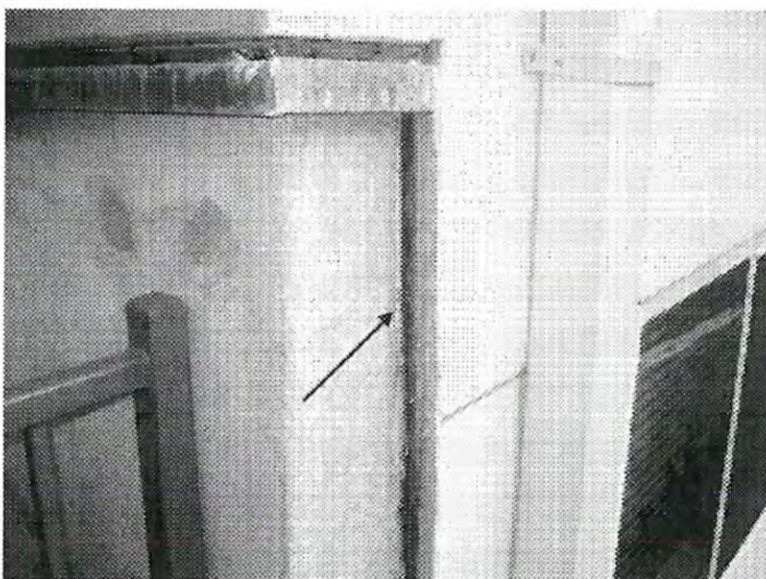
Exposed Tyvek tape unsealed at exposed concrete on Building C.
